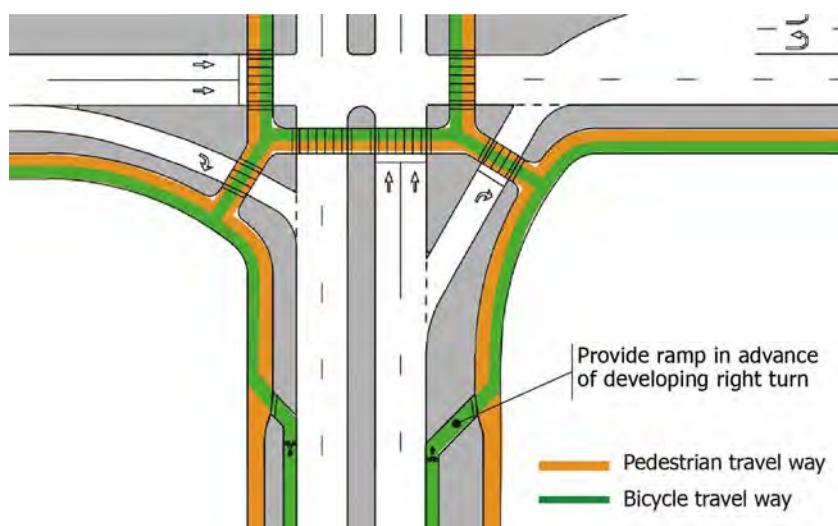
Ramping on-street bike lane to sidewalk level upstream of the crossing.
